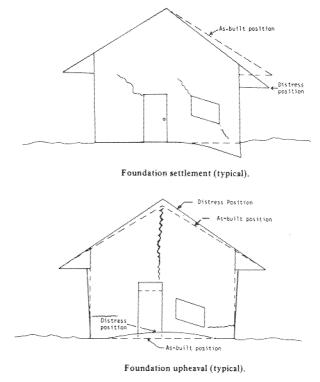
Typical damage to buildings caused by expansive soils in Boulder County (from Shelton and Prouty, 1979).
